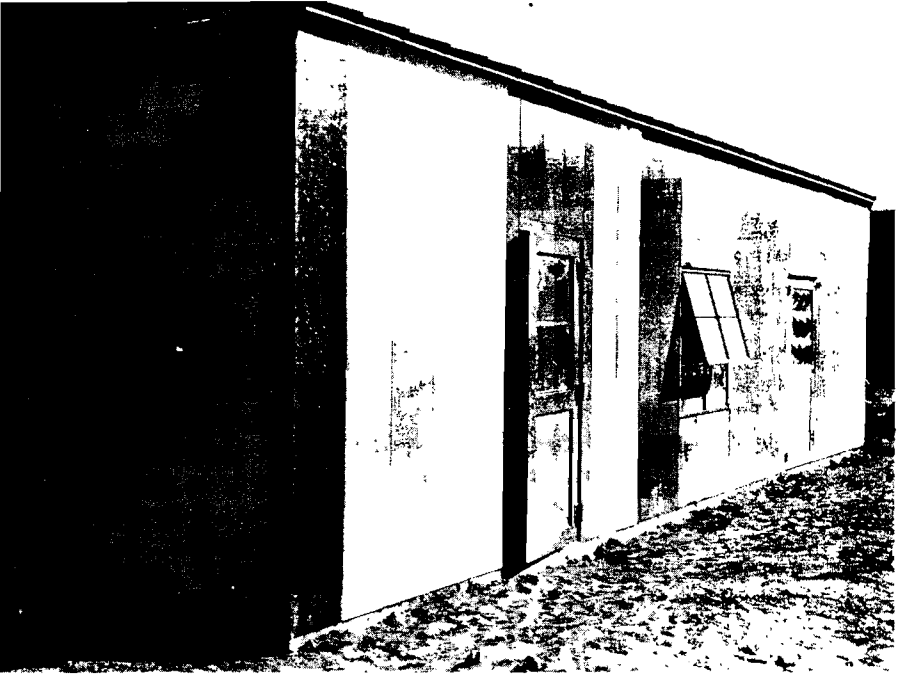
Exterior of self-framing steel panel building before a nuclear explosion, Nevada Test Site.
